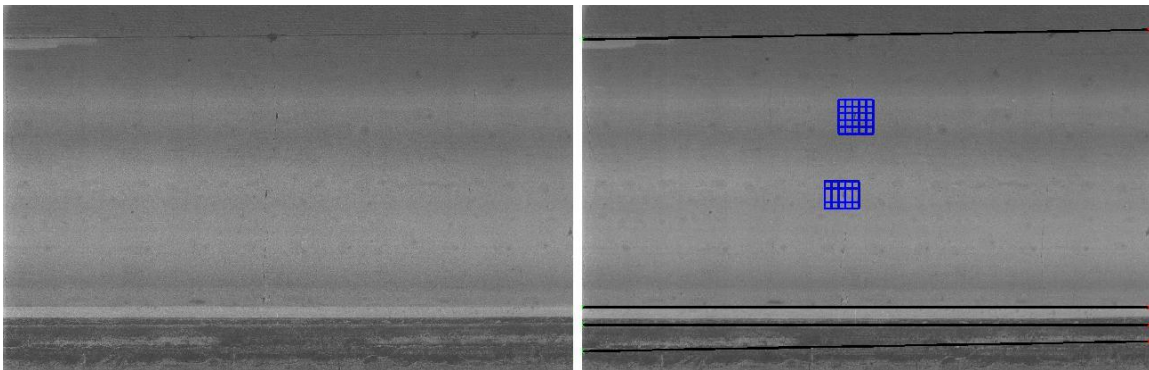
Example 1 of low-severity concrete crack: raw crack (left) and crack detection (right)
